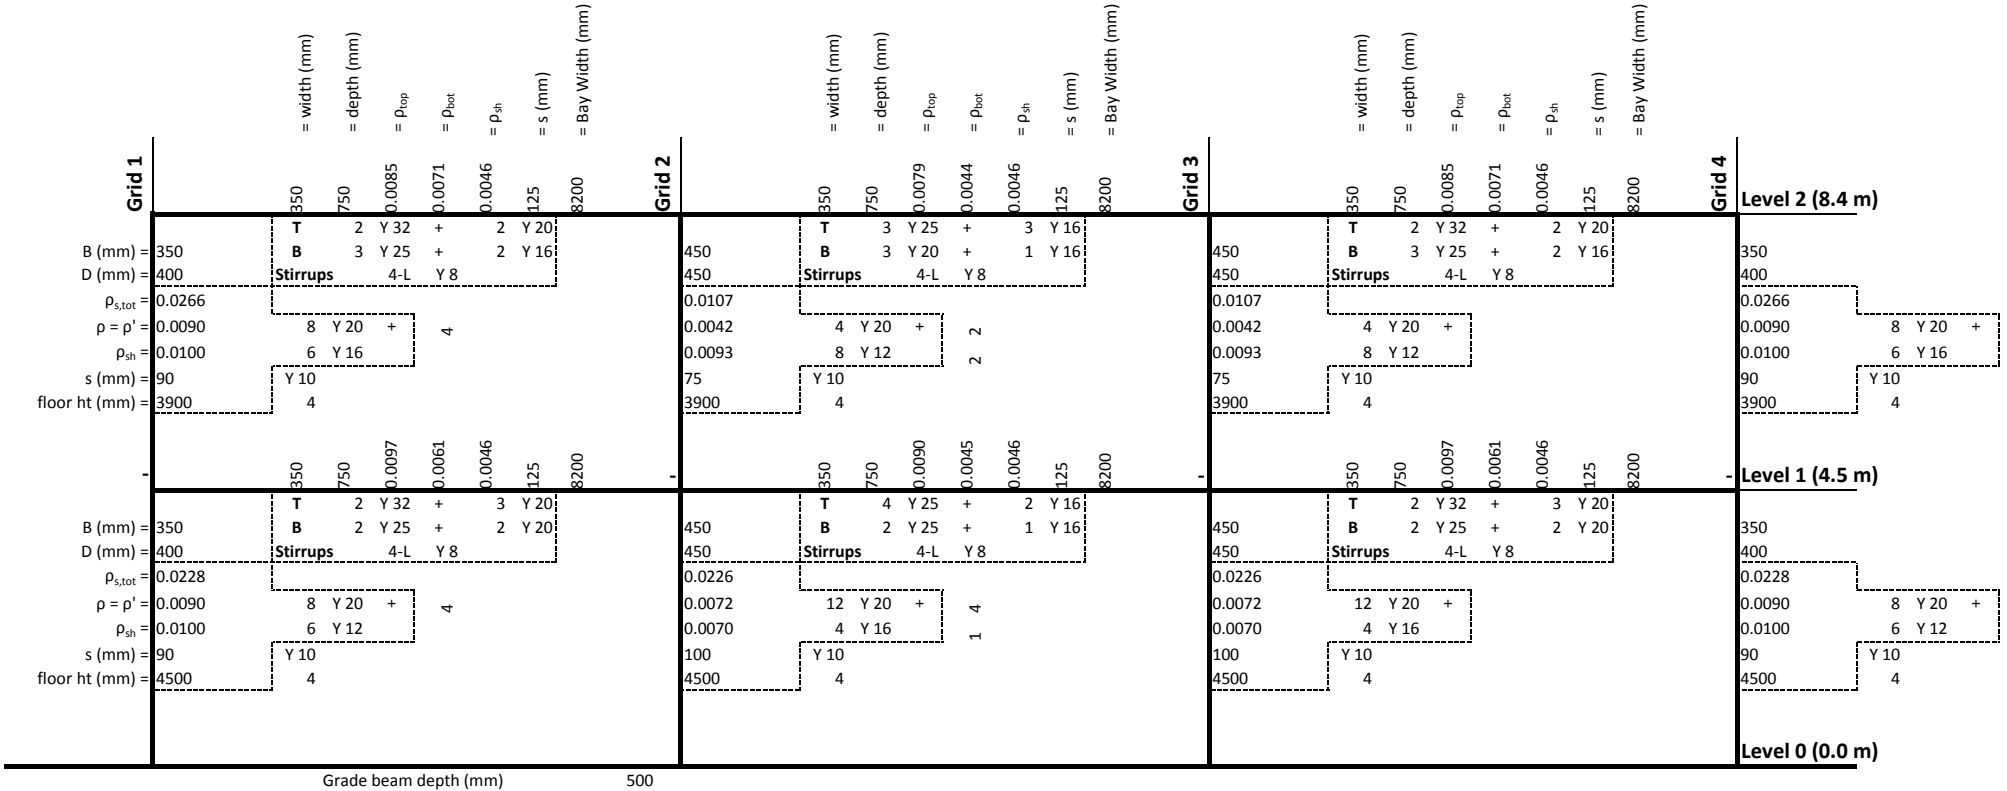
Provided reinforcement and modeling details for building ID 2211
